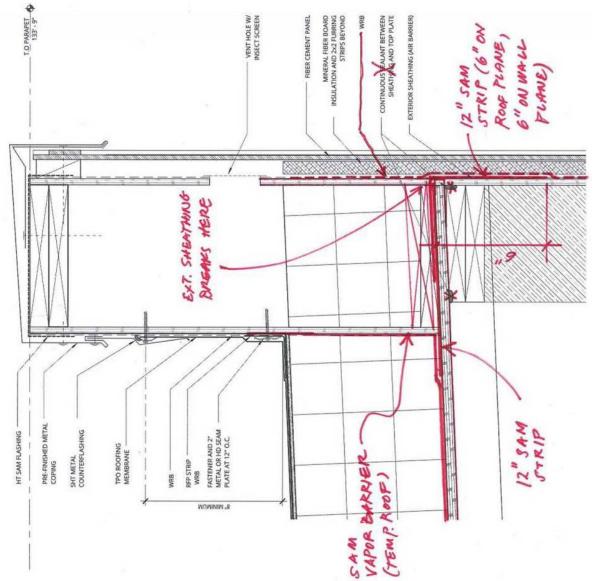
Contractor's coordination drawing of typical exterior wall to roof detail
